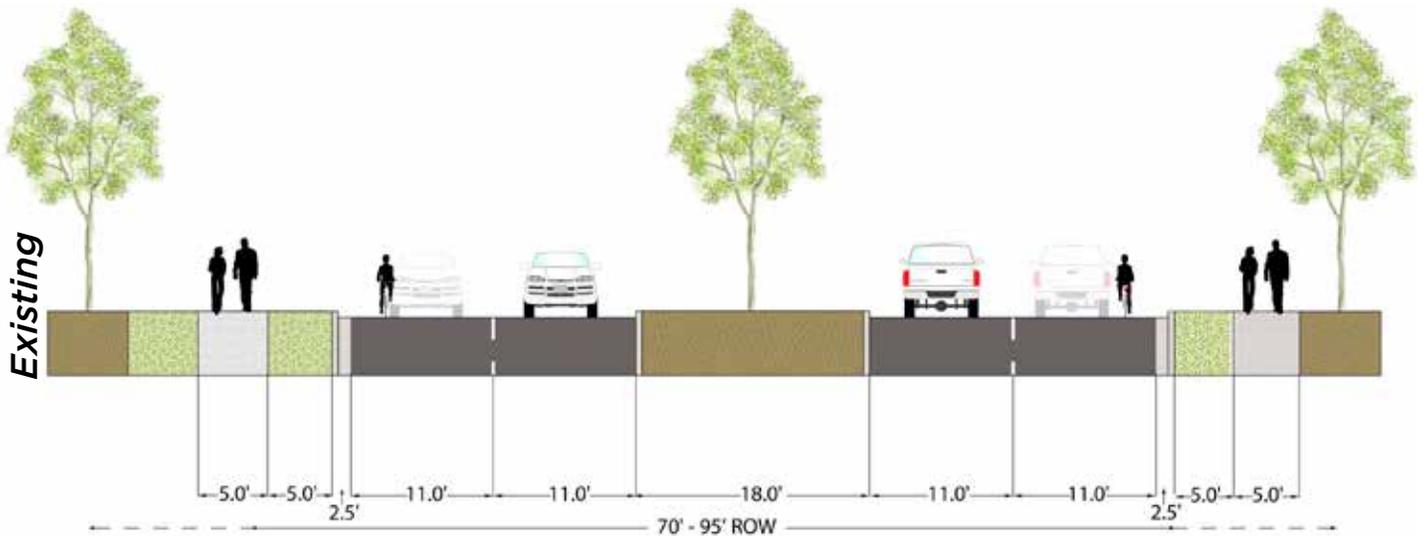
Bailey Road Reconfiguration Concept- West of NC 115
